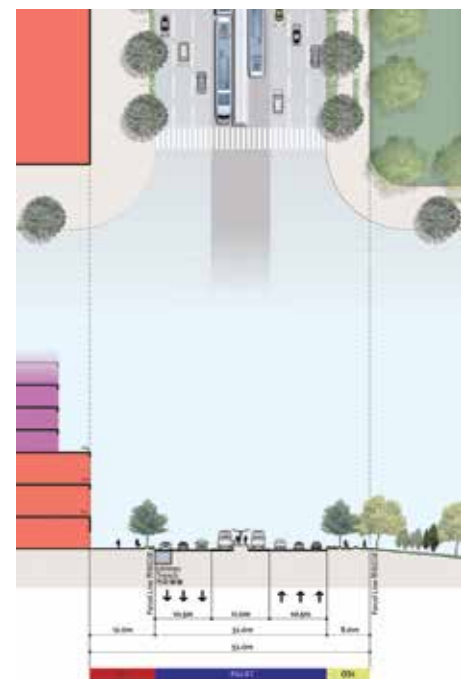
The cross-section of the planning area's most significant street shows it set between a key open space and the new CBD. FEI HU DA DAO CROSS-SECTION. (Source: Gensler)
